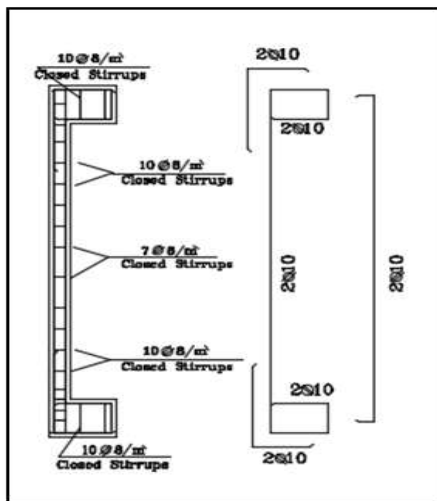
Reinforcement Details for Eccentrically Loaded Columns (UHPC2 and UHPC3)
